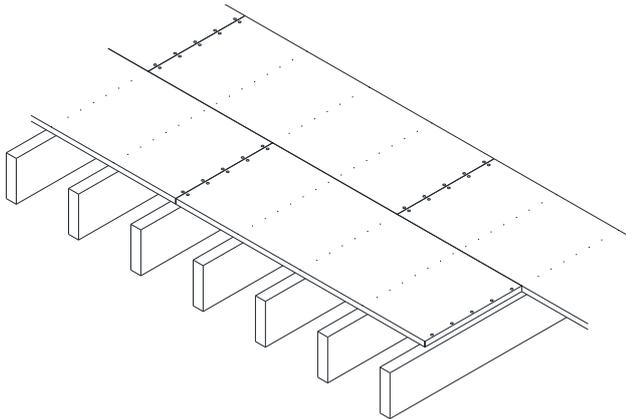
T & G panels assembly (Laudio Tech) : Short side edges should lean on beams. (ENV 12872).
